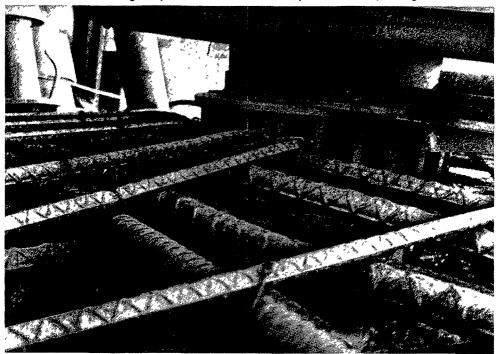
Crisscrossing arrays of rolled steel bars ready for concrete pouring.
